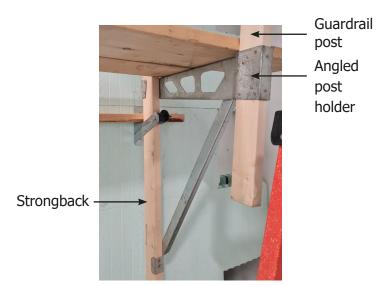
Zat™ Bracket connection to Strongback and guardrail
